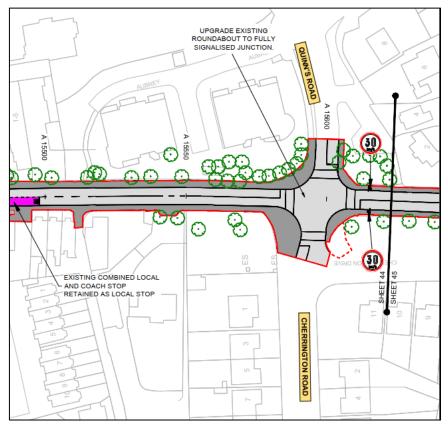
Extract from General Arrangement Drawing at Dublin Road/ Quinns Roundabout (Sheet 44)
